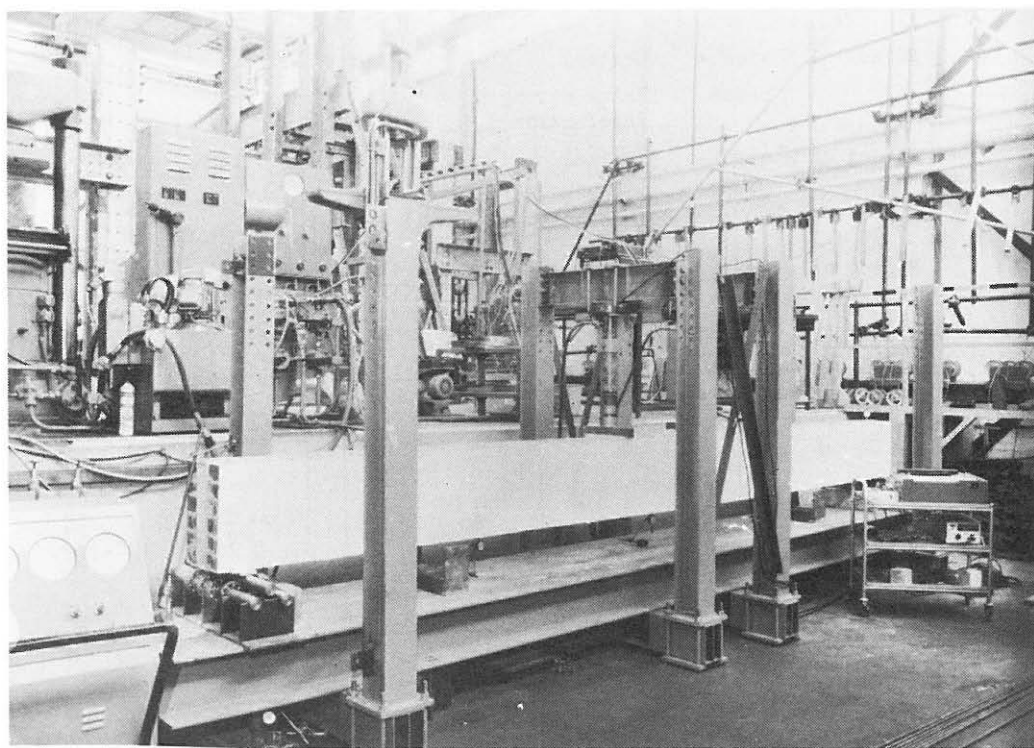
Showing the test arrangement and a beam of 6.3m span under test.
